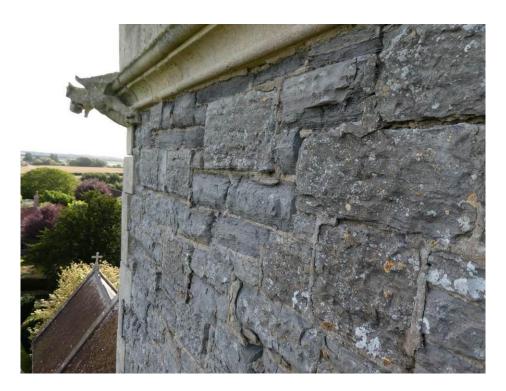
P1000241 Example Area of Deteriorating Lias Masonry & Cement Pointing in North Elevation Belfry Wall
